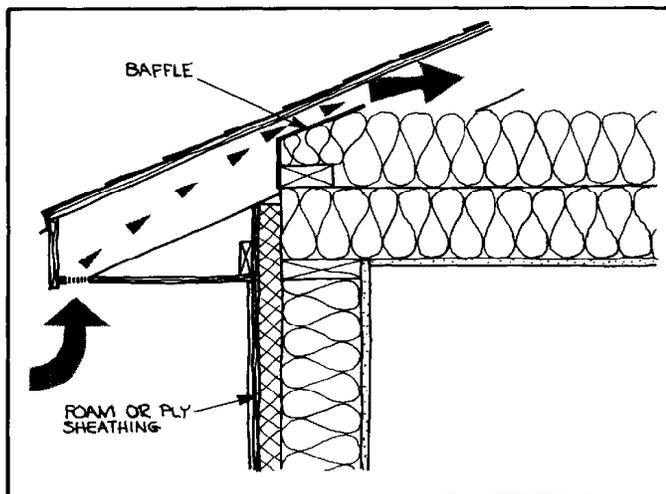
To get extra room for insulation with conventional rafters, you can set a second top plate above the ceiling joists. You may want to tie the rafter to joist with metal connectors.
